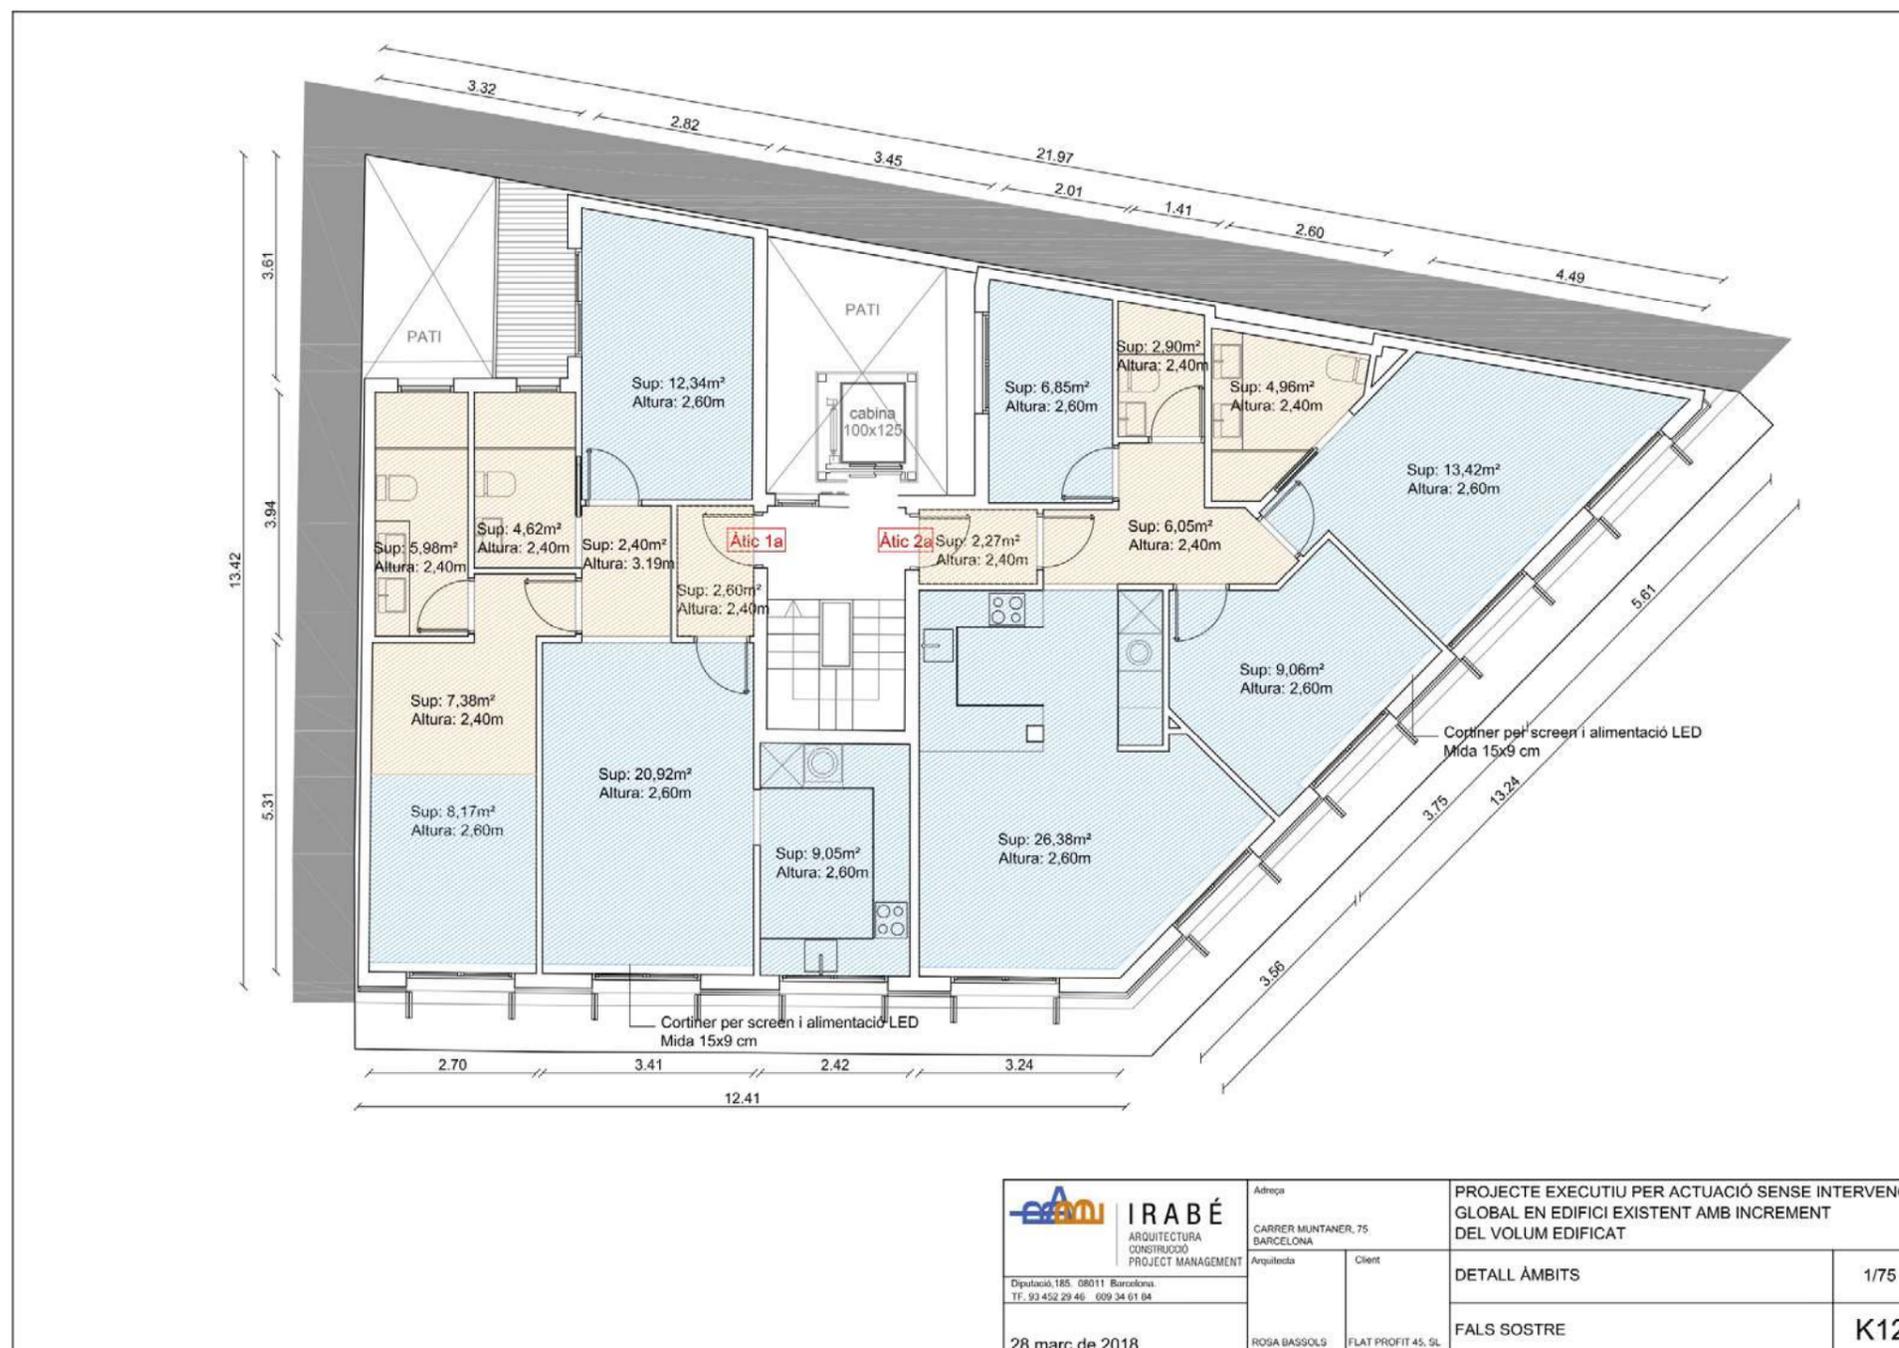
Floorplan of the proposed attic apartments, showing the area of each room.
